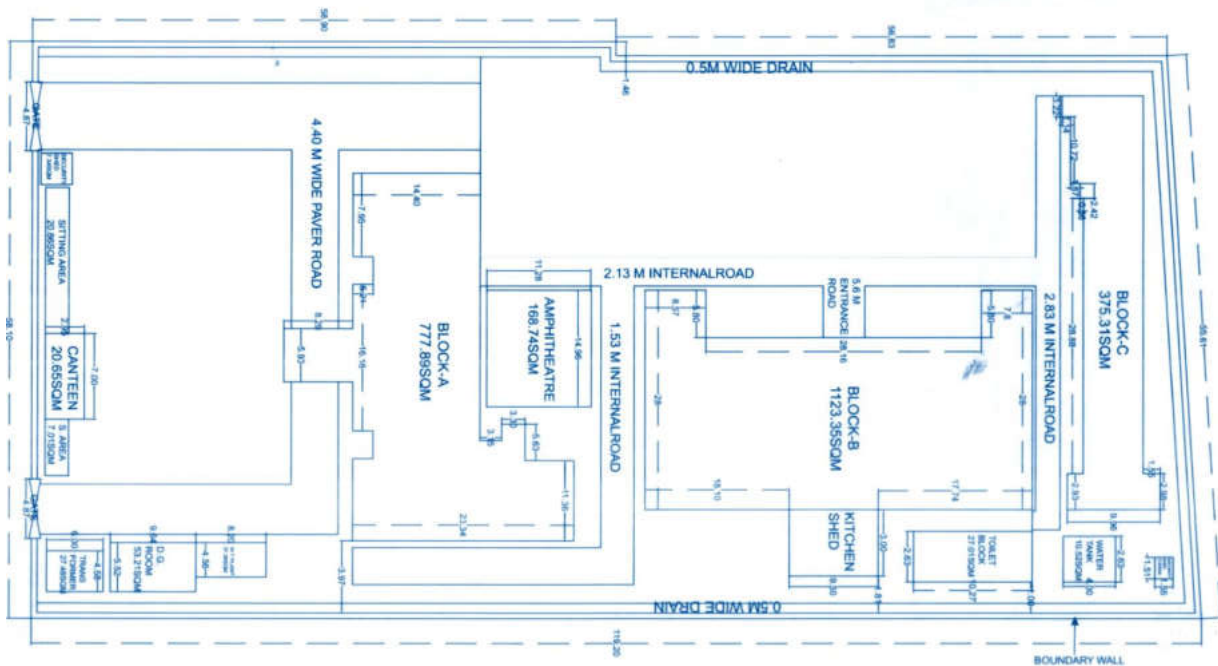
Site plan of Nazir Ajmal Memorial College of Education
